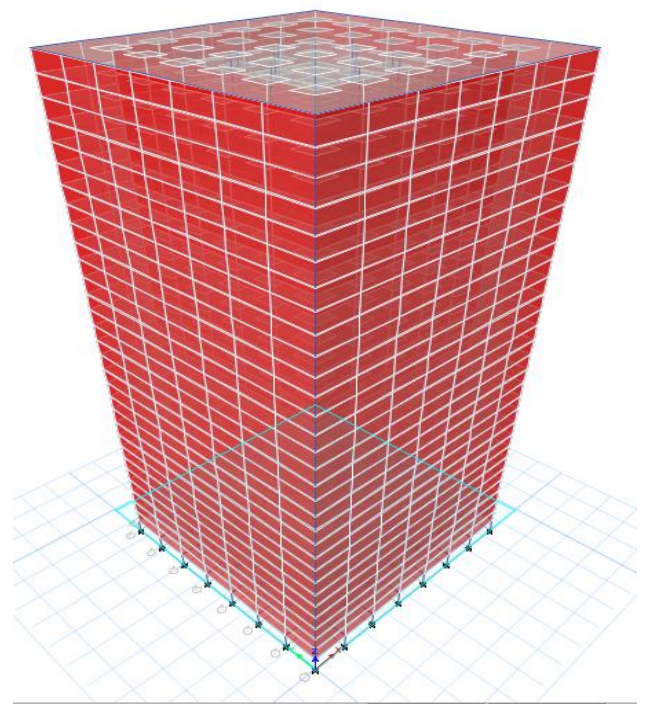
3D view of building with masonry infill 50% infill in double outer core with perimeter beams in flat slab structure.
